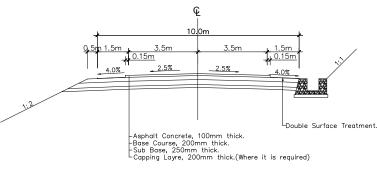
Applicable Typical Cross Sections(1/2)
